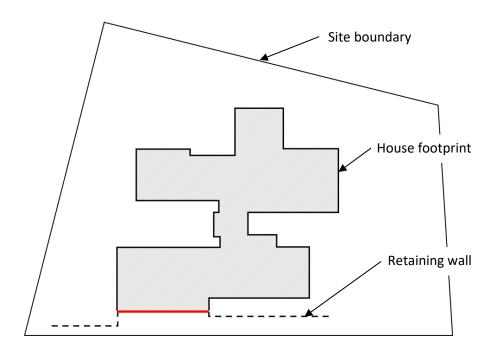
Diagram showing the site layout. The portion of the retaining wall in question is highlighted in red.
